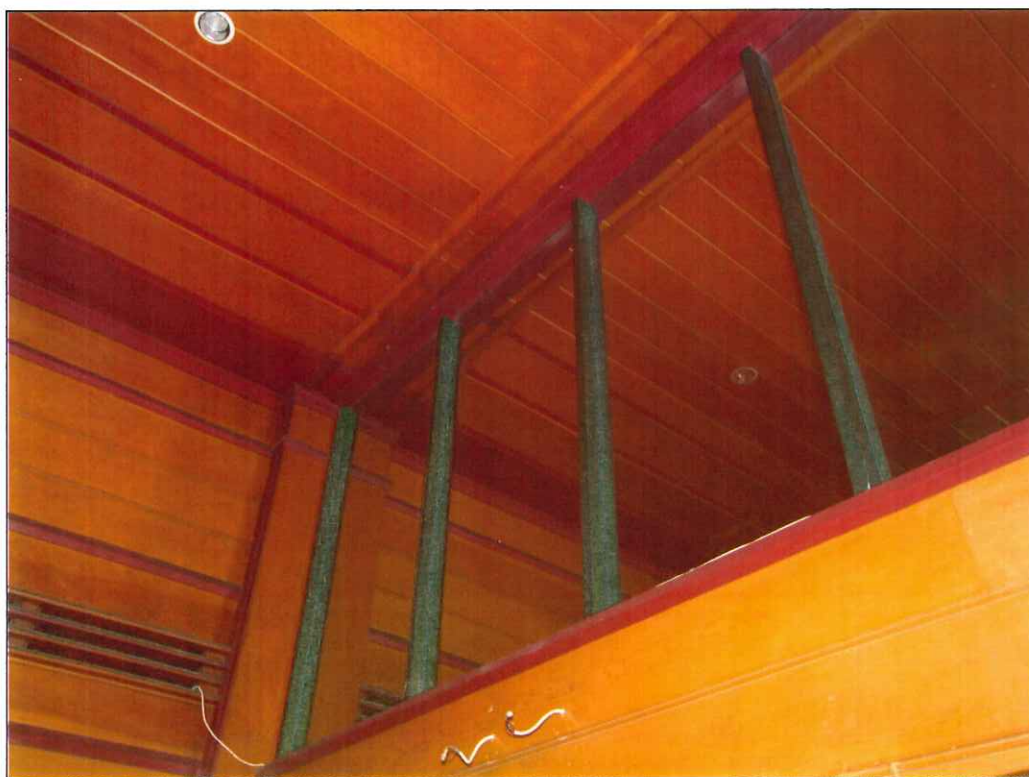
Detail where partition wall meets ceiling and pilaster (Chattel, 2016)
